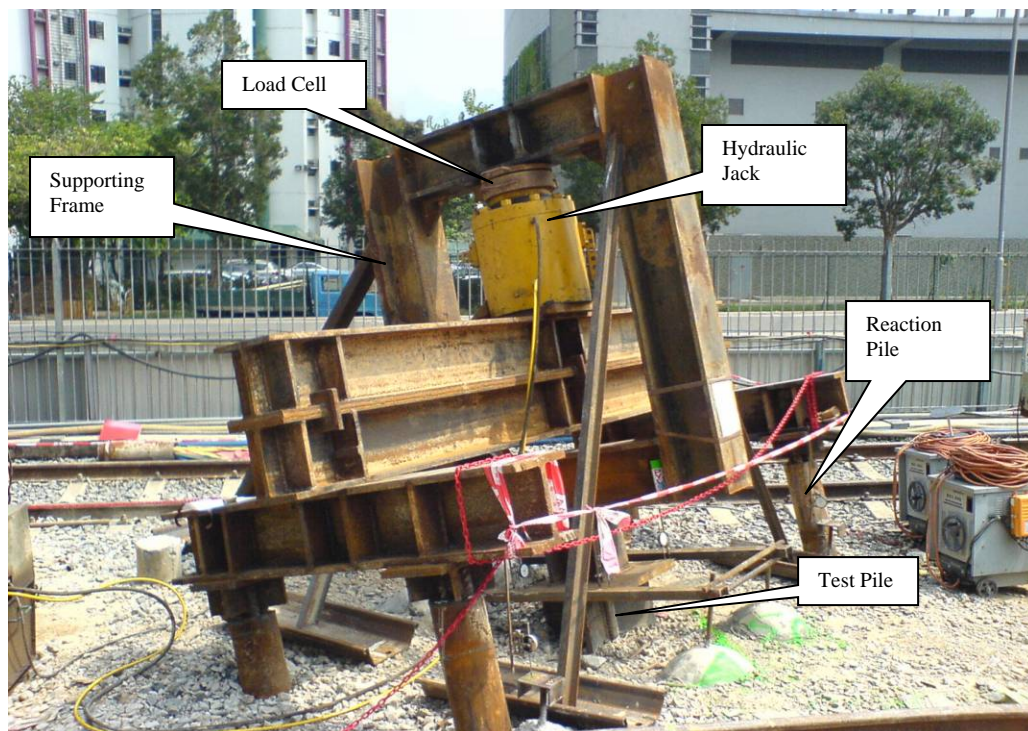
Photograph showing Arrangement of a Tension Pile Test (Raking Pile)
